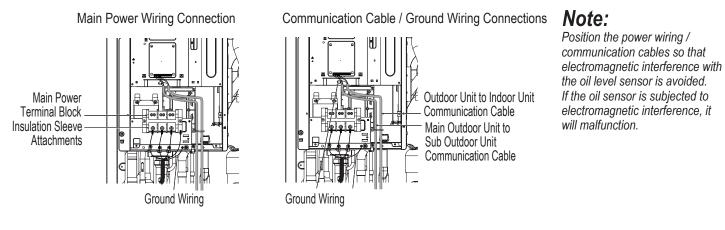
Internal Routing and Terminations in Large Frame Outdoor Units.
